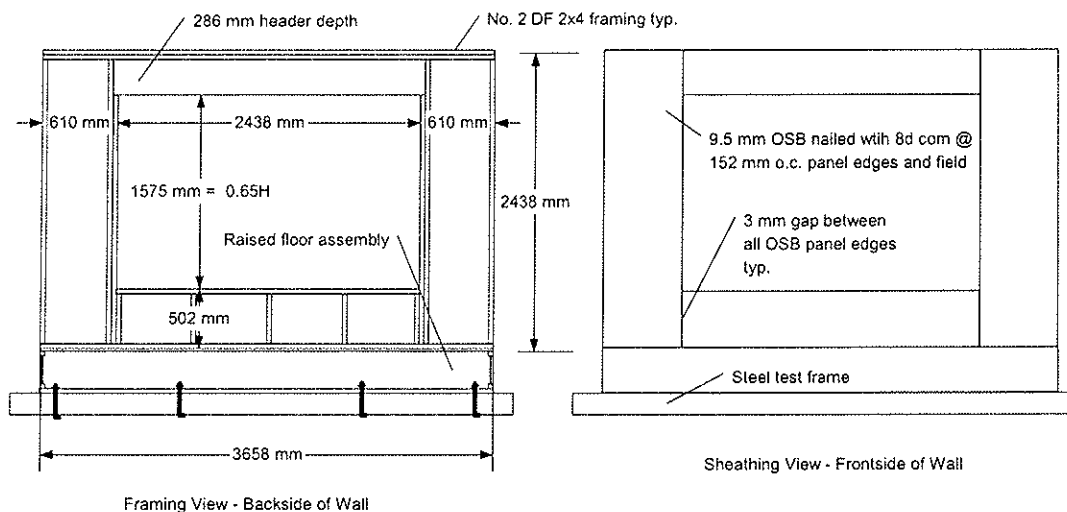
Wall construction details for the 4:1 aspect ratio walls segments used as the baseline
